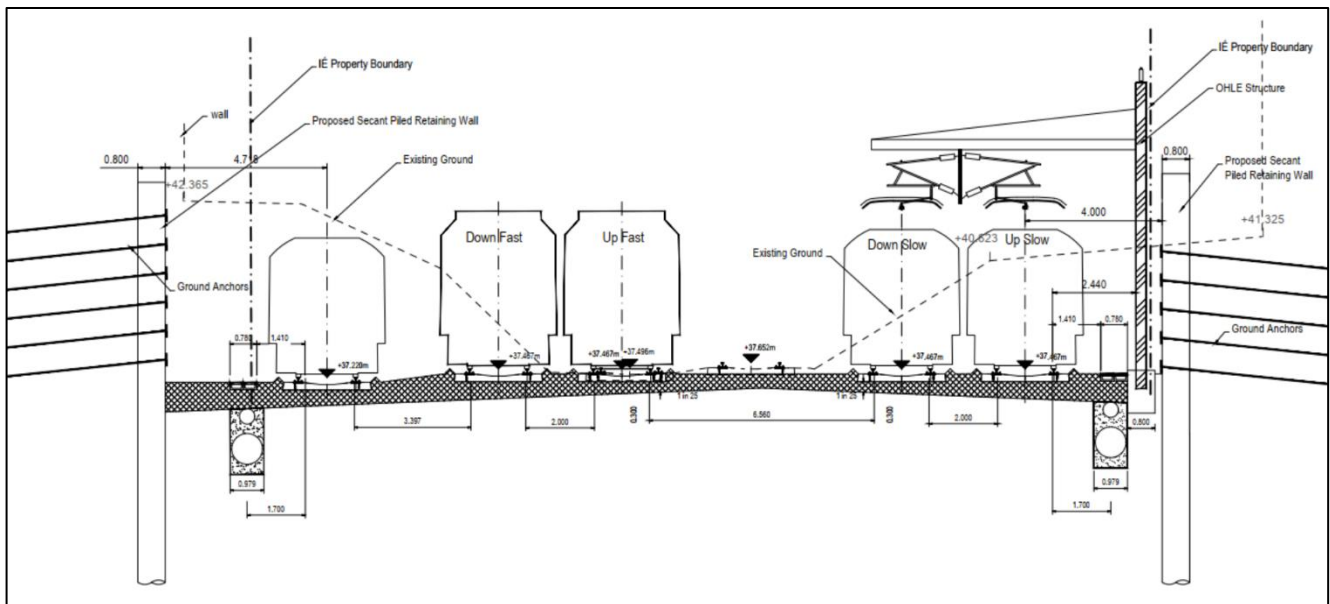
East of Kylemore Road Retaining Wall & Ground Anchors – Facing West
